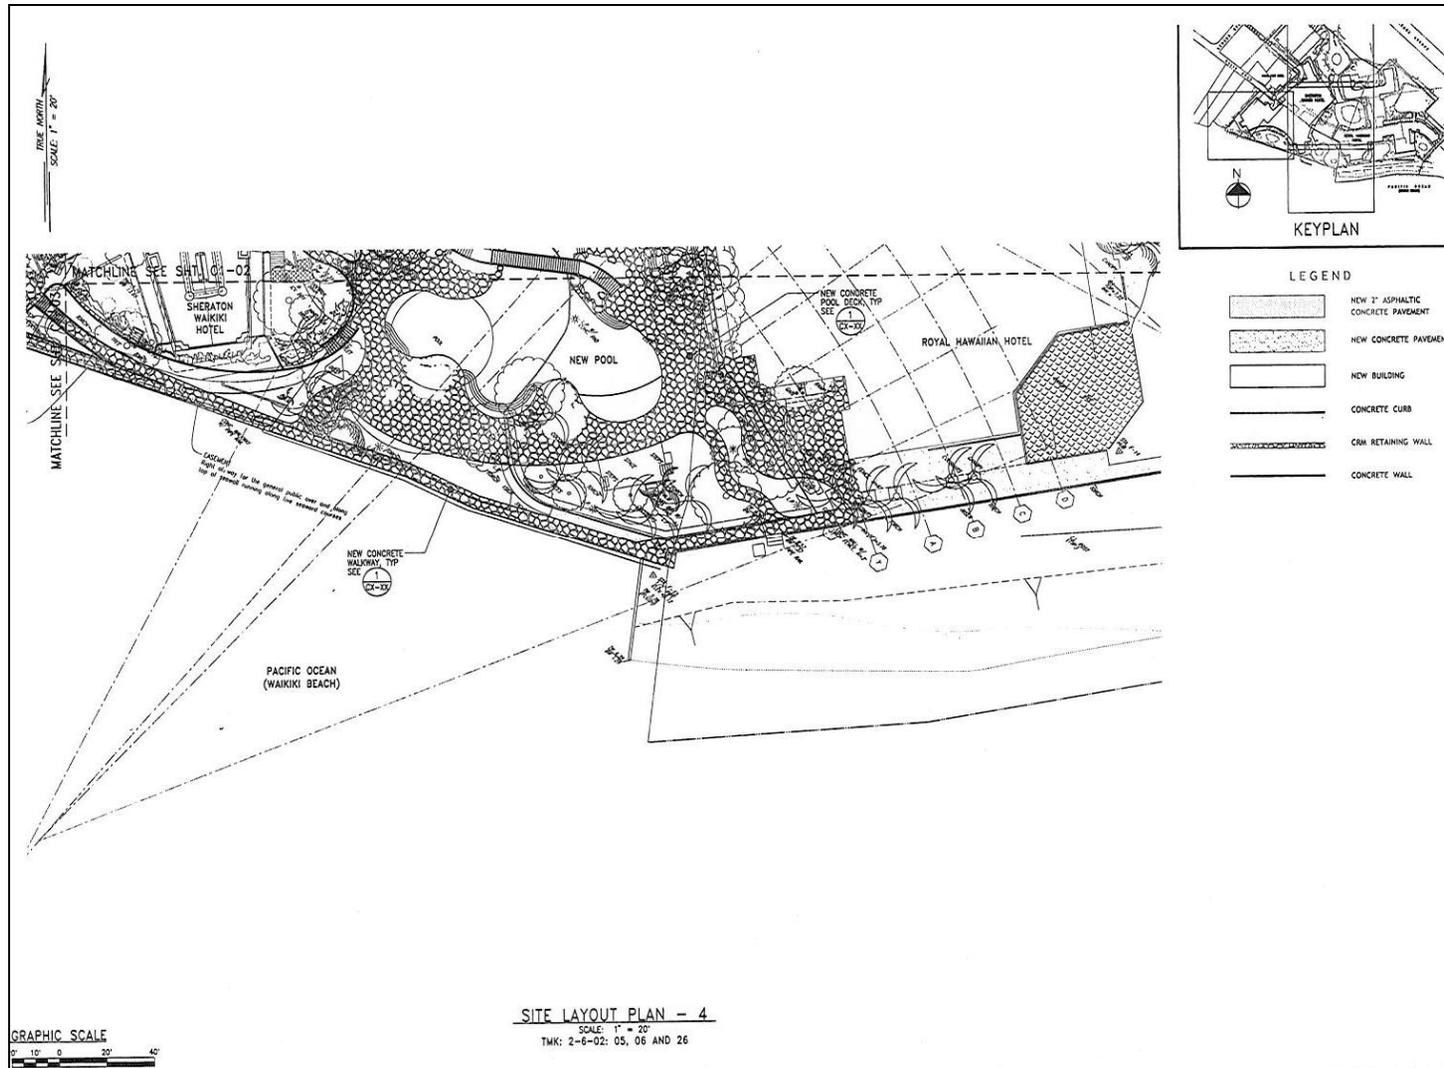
Renovation Site Layout Plan 4 showing seaward portion of the new two tier resort pool between the Royal Hawaiian and the Sheraton Waikiki
